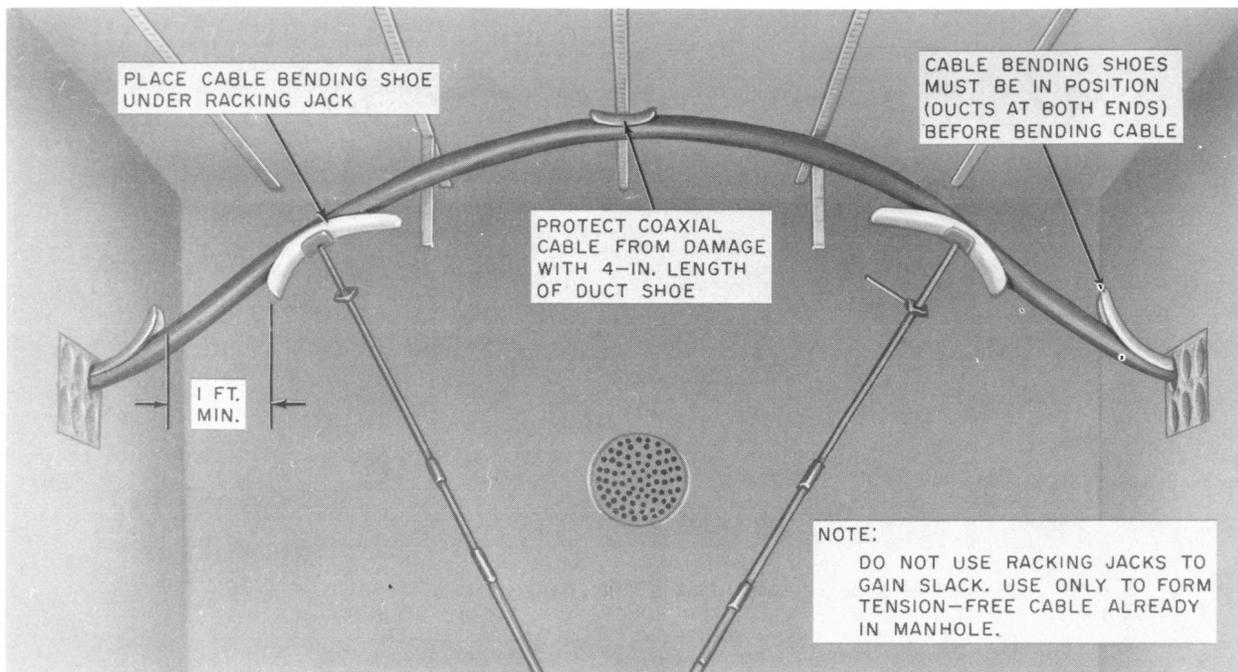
Use of B Cable Racking Jacks on Coaxial Cable
